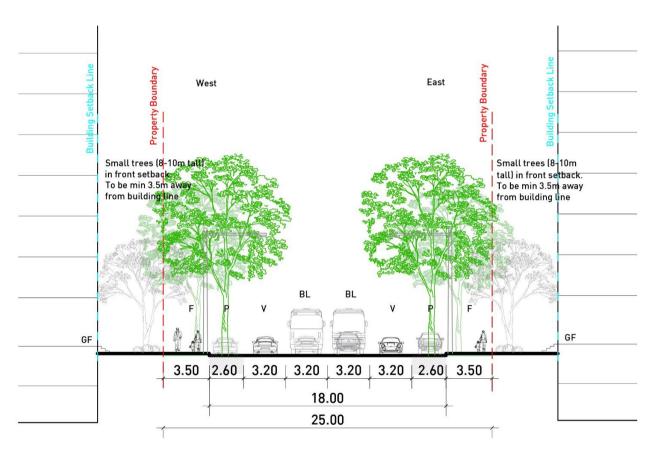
Type 1A Major Road Building to Building (NSR 2)
